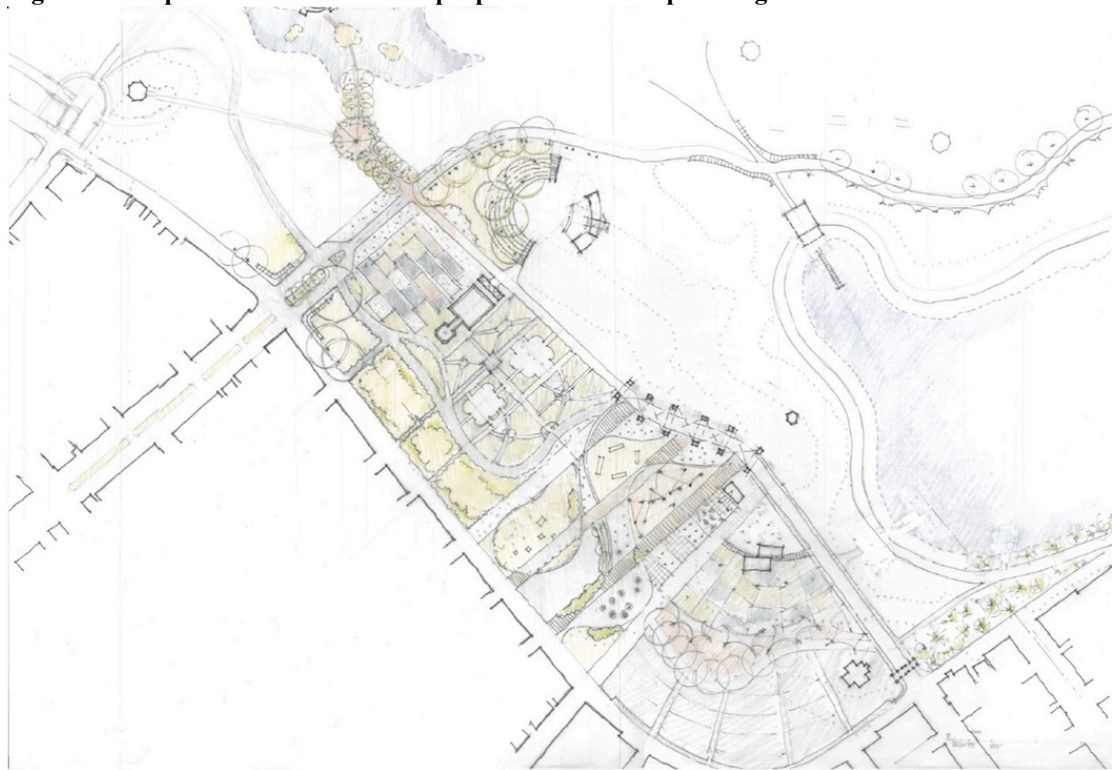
Proposal: Druid Hill Park: study southwest park edge
